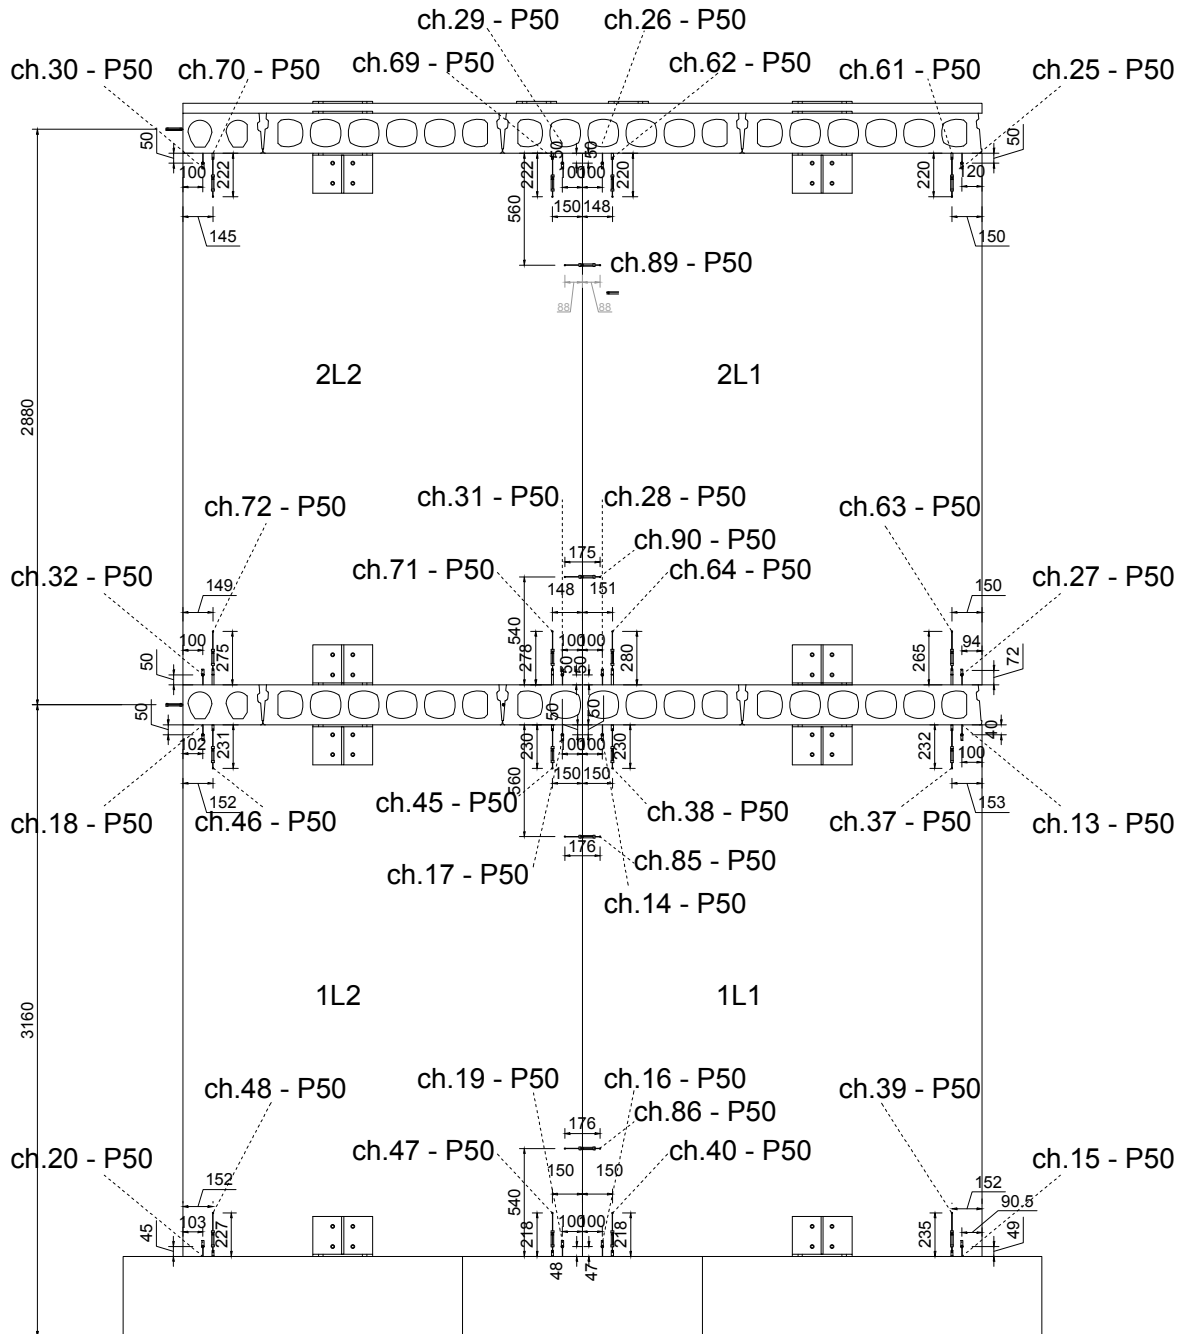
Schematic of the installed instrumentation: front views of the specimen – Lateral walls, A'.
